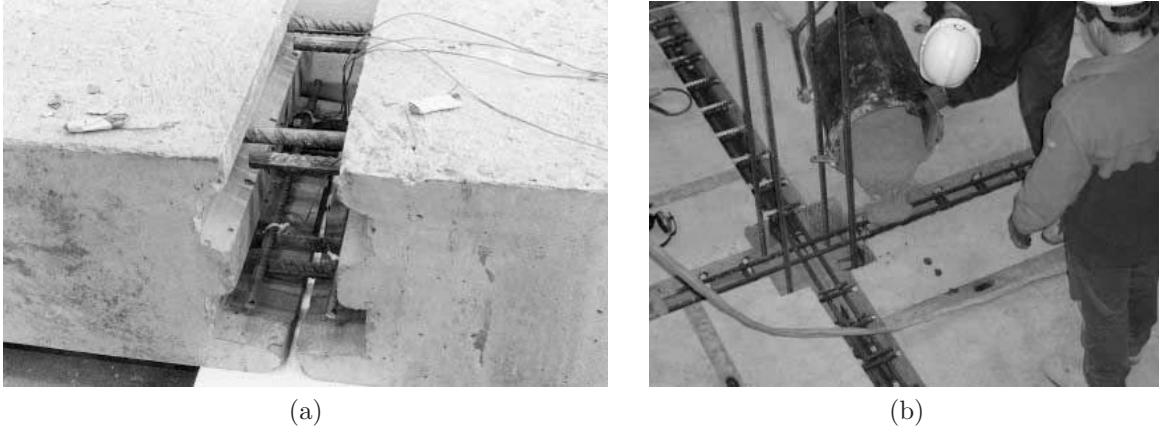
Precast column and floor slabs are joined in-situ by JointCast [CRC]
